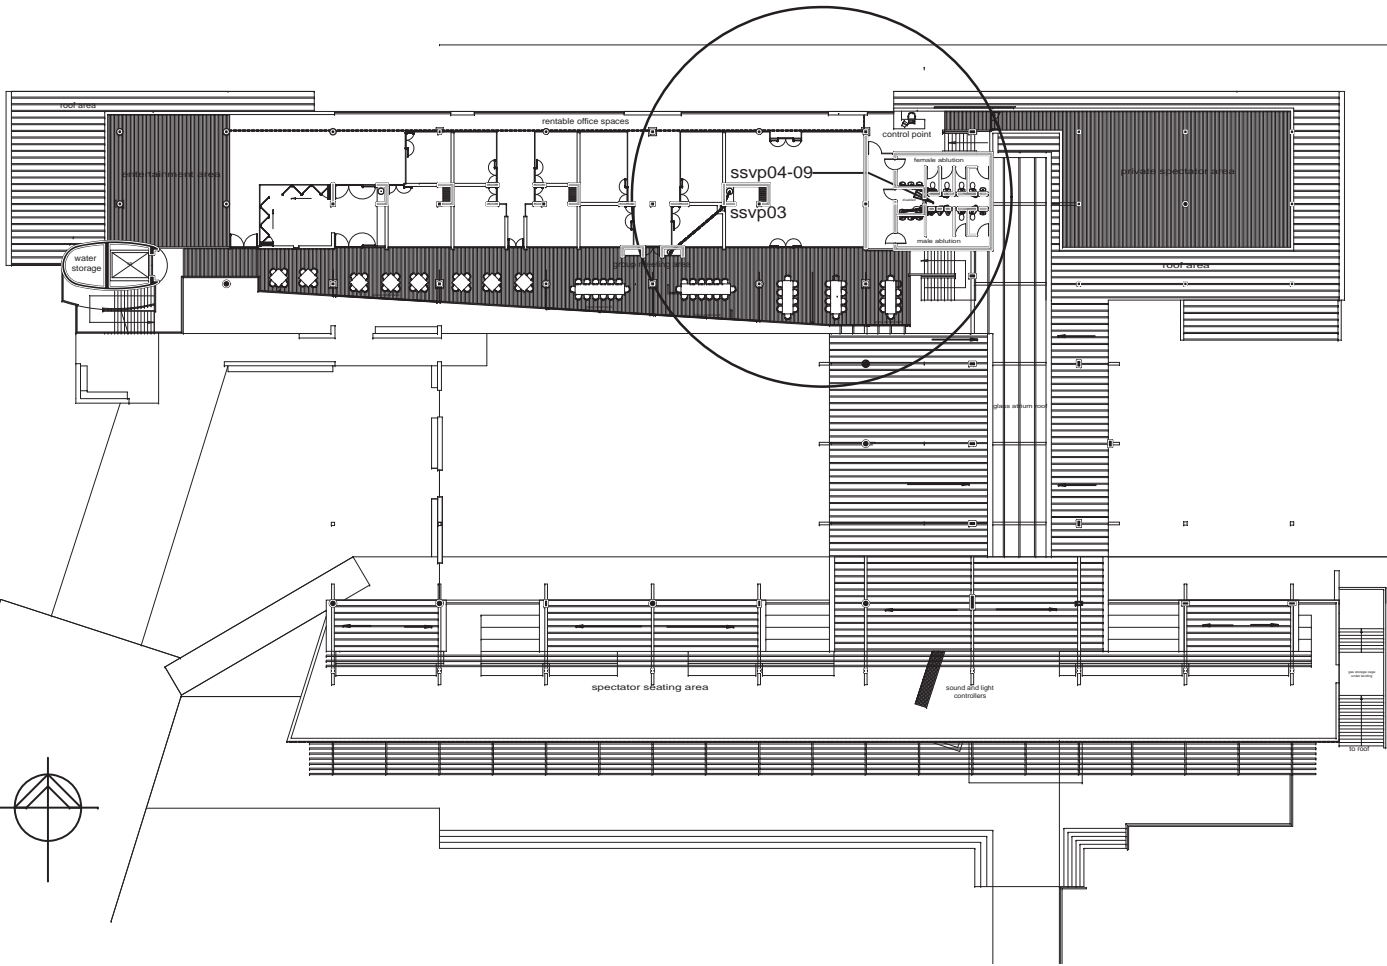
drainage lay-out (Upper floor 1:550)
